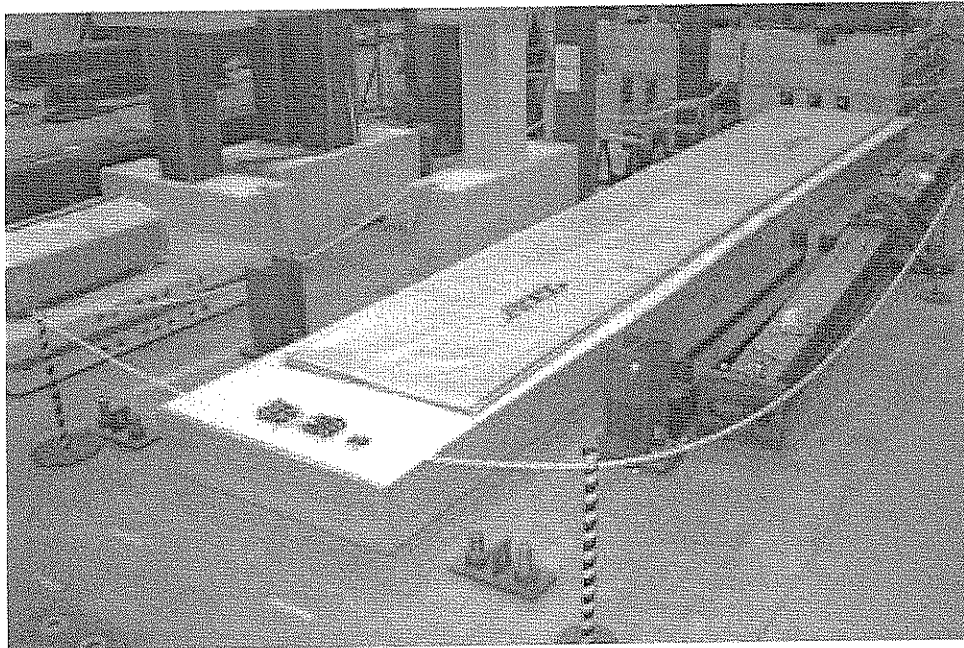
Air bladder shown in place on the concrete spacer blocks.
